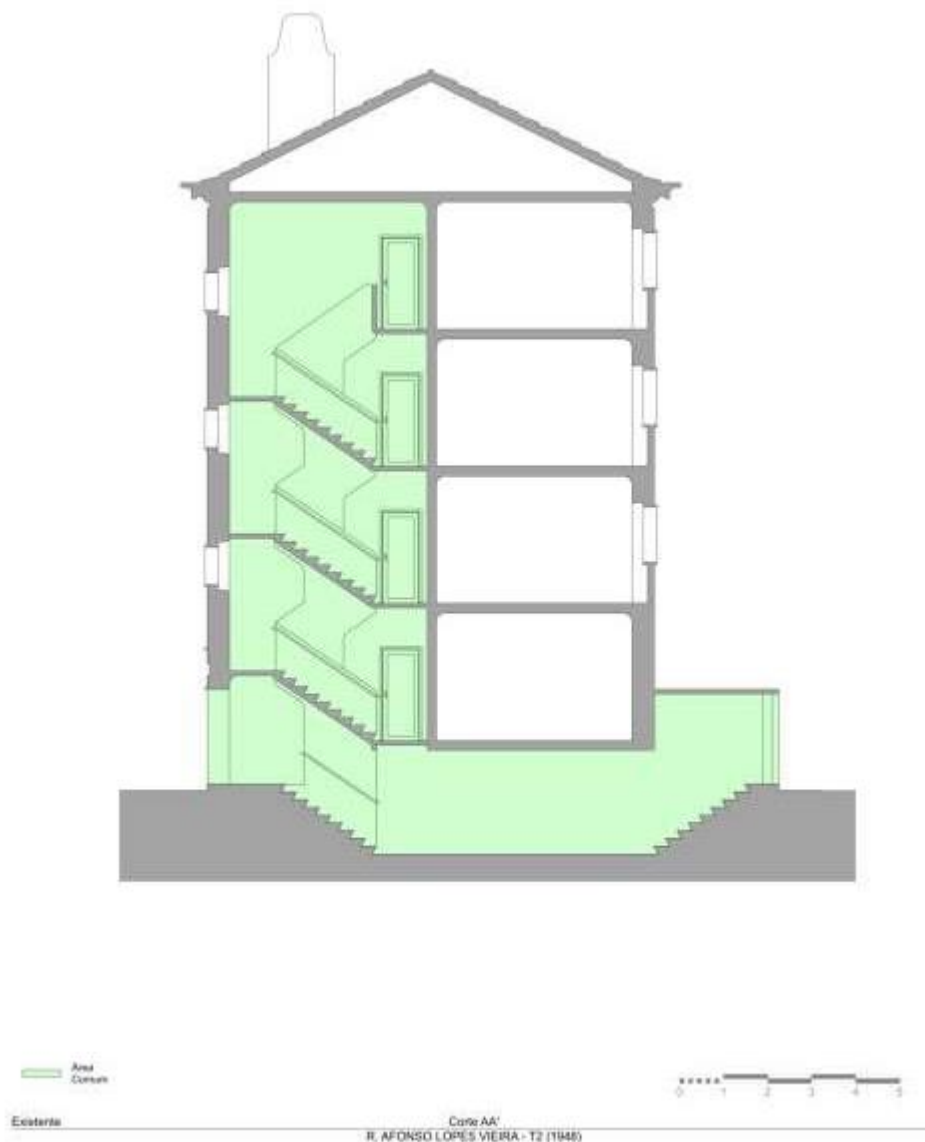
Street Afonso Lopes Vieira, T2 Building – section through tunnel and staircase – existent
